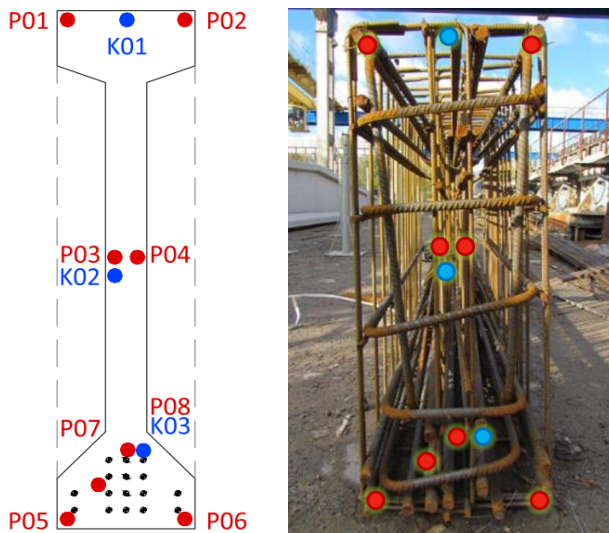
Arrangement of EpsilonRebars (P) and temperature sensors (K) within smart girder: cross section and front view
